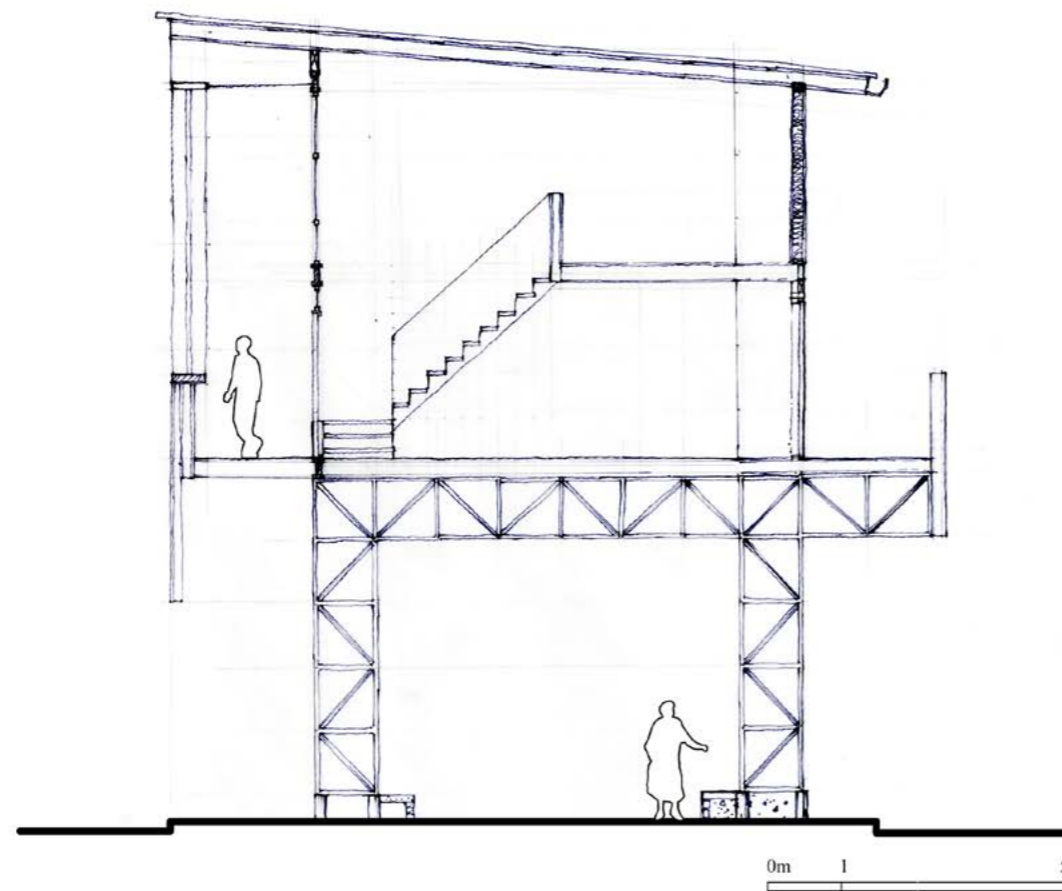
Section through house Type 1. The timber frame construction allows for simpler joinery and adaption for the inhabitant
